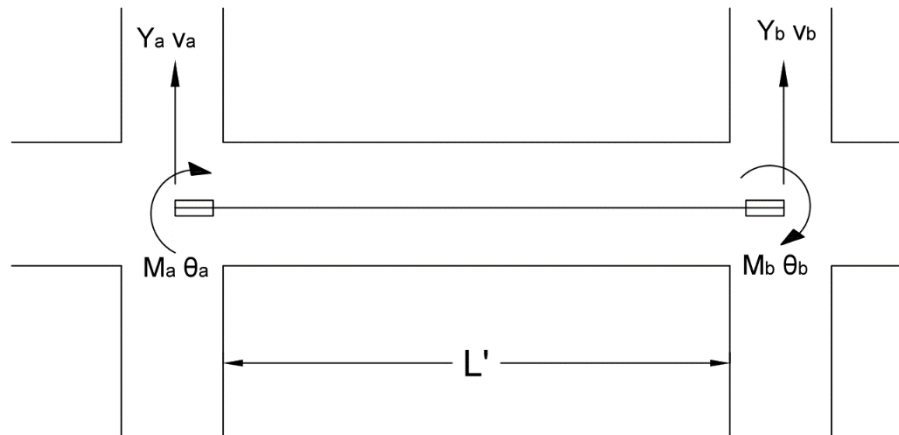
Typical beam element with degrees of freedom adapted from Reinhorn (2009).
